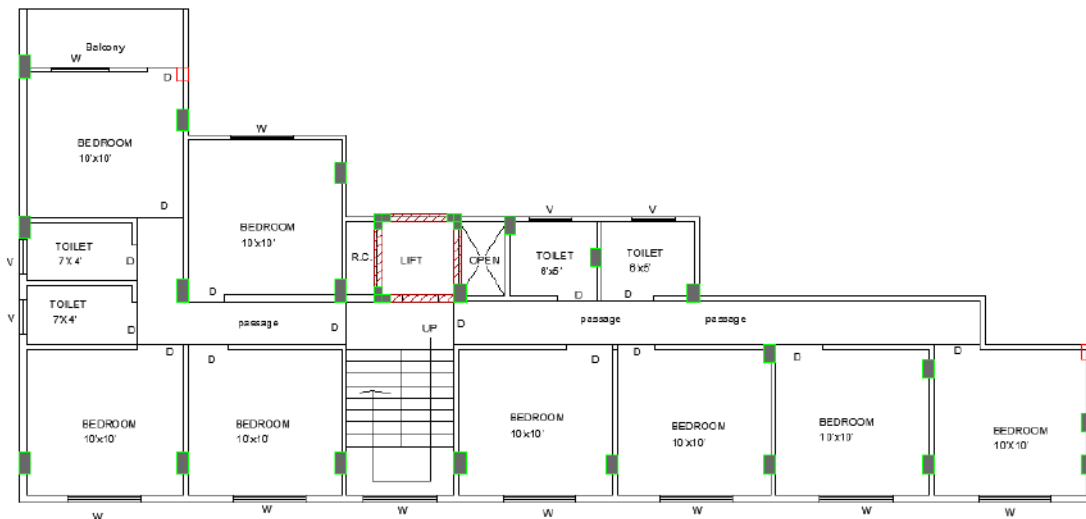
Plan of Building at Typical Floors (1st, 2nd, 3rd, 4th, & 5th)
